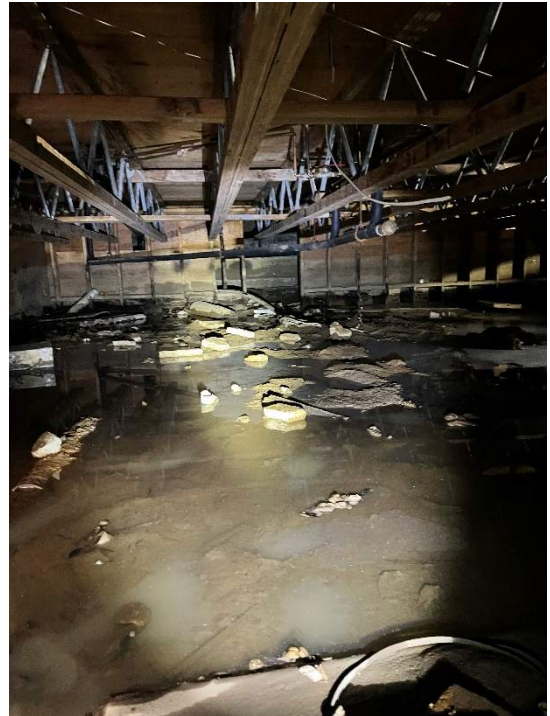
WATER AND MUD IN CRAWL SPACE UNDER 1975 ADDITION
